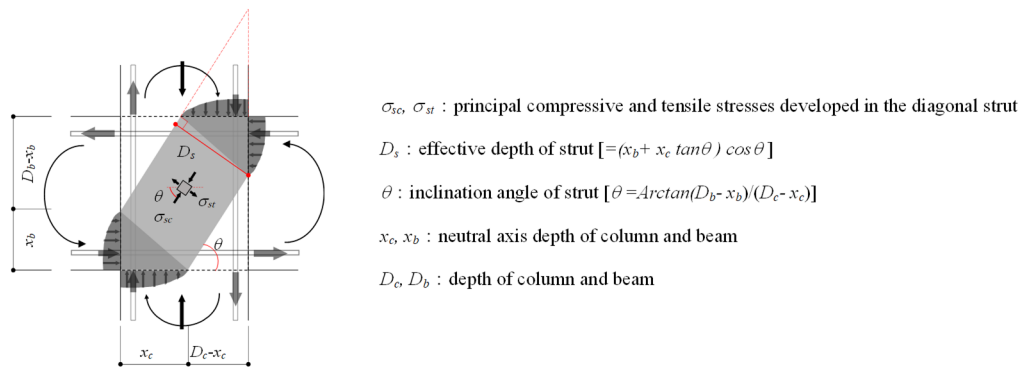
Conceptual diagonal concrete strut developed inside the joint core.
